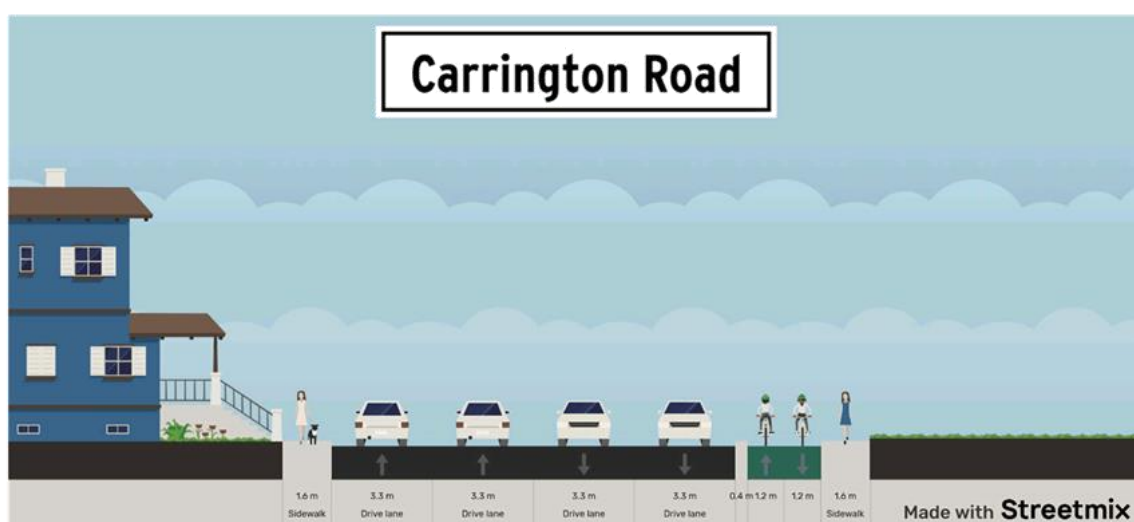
Cross Section of Proposed Carrington Road (134 Carrington Road)
